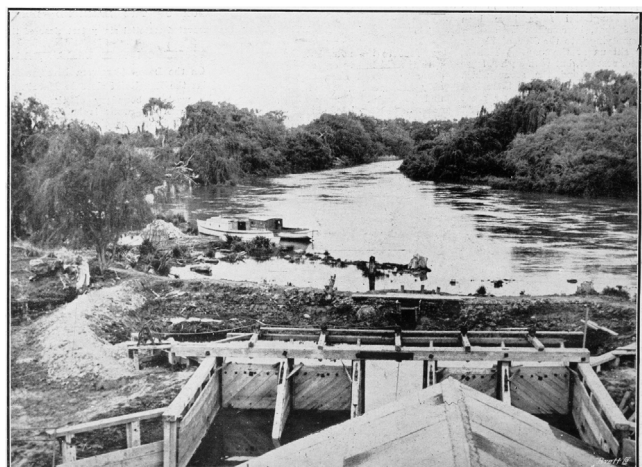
Government engineering work on Rangitāiki River, including the temporary construction of dam, in preparation of the construction of a new river outlet in 1912.
